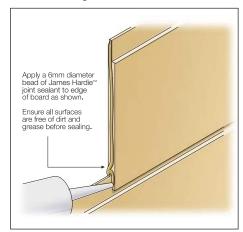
SEALING EDGE OF BOARD (STEP 1/2)
